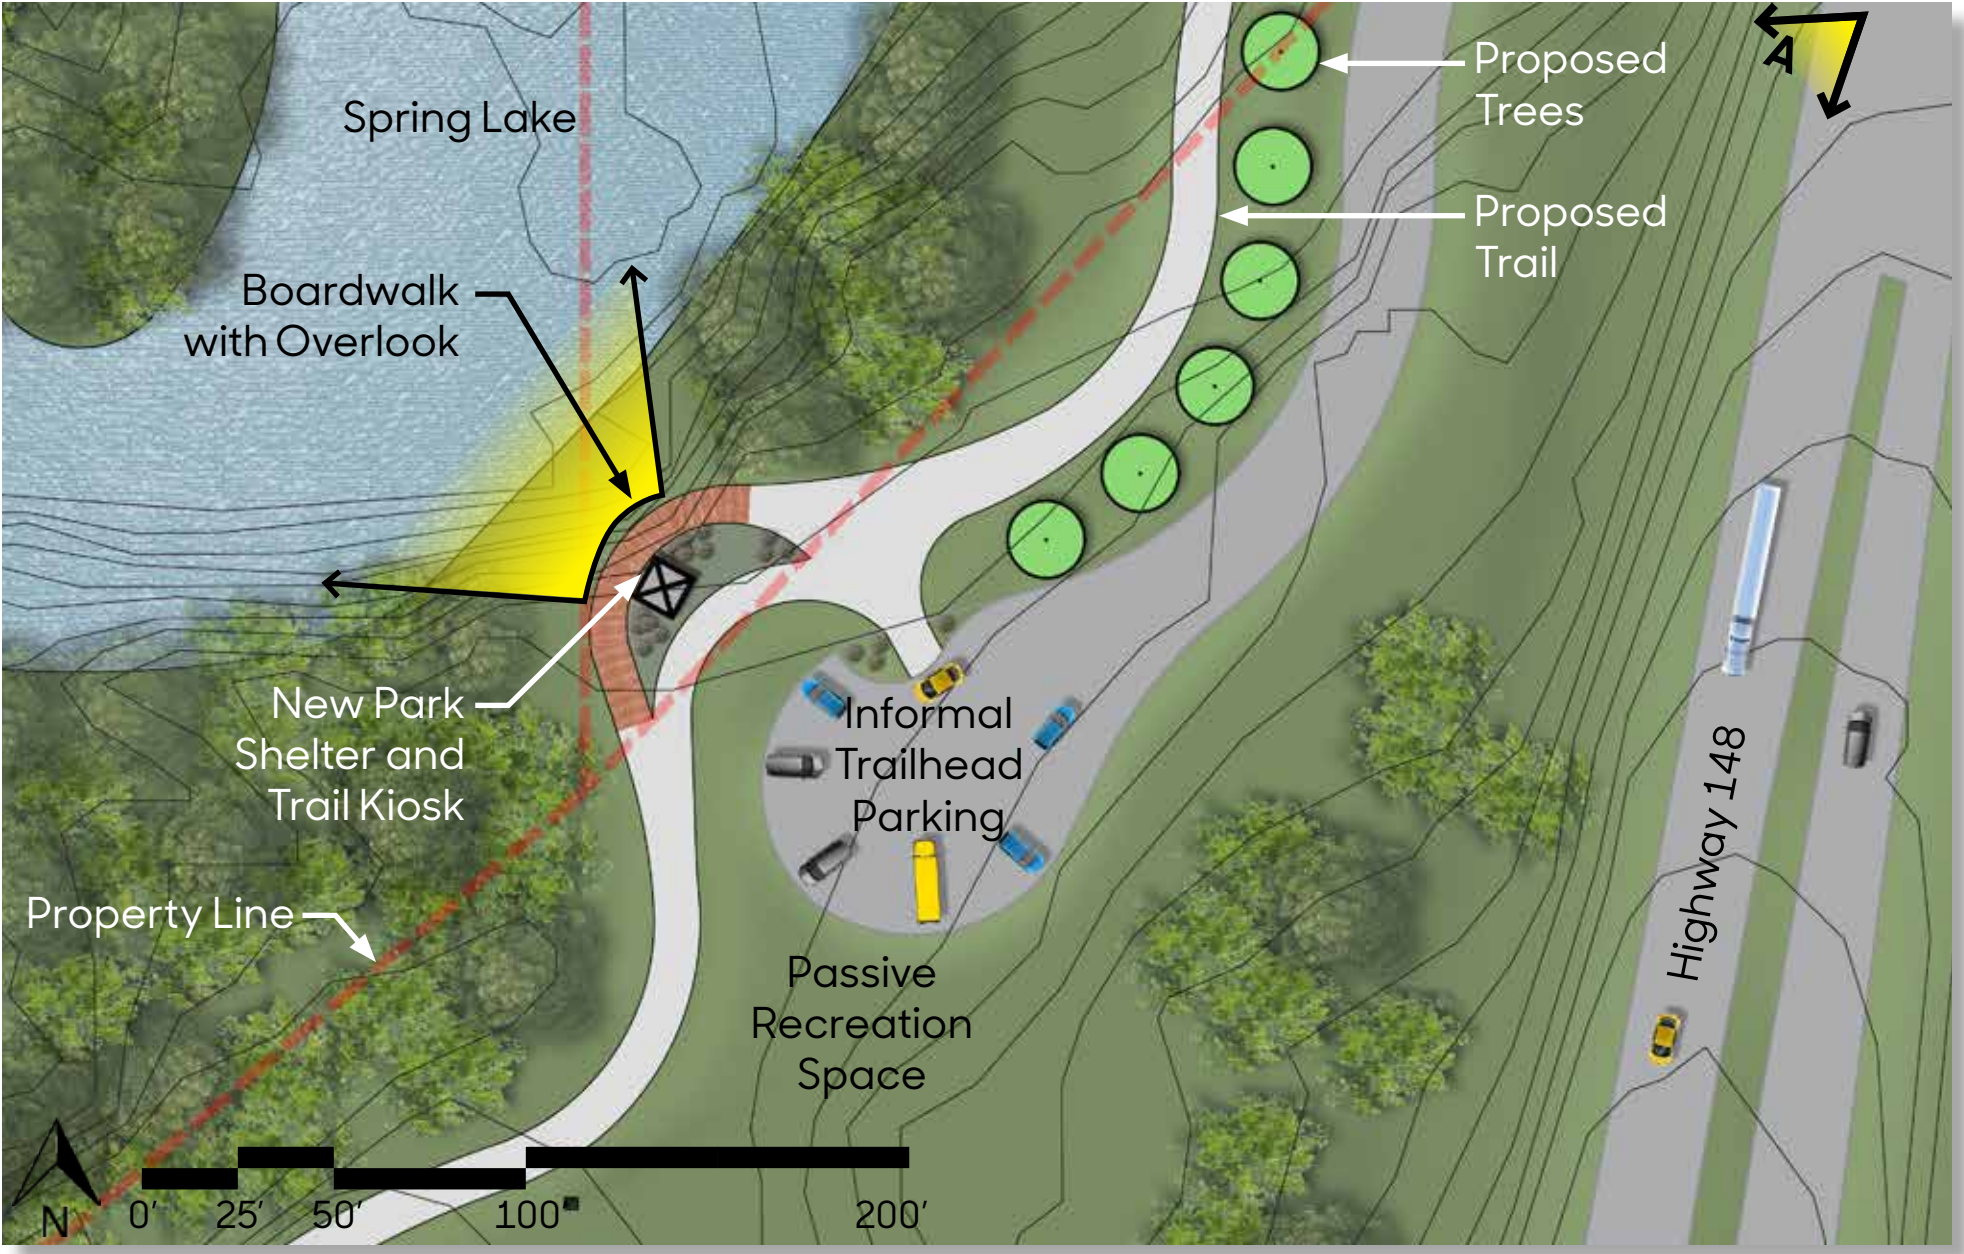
Detail Plan of Spring Lake Park Trailhead.
